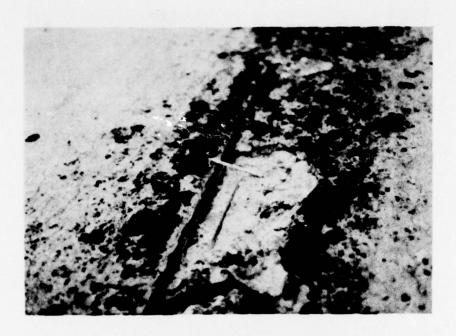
Longitudinal Joint Distress Caused by Concrete Deterioration, Stapleton Airport.
